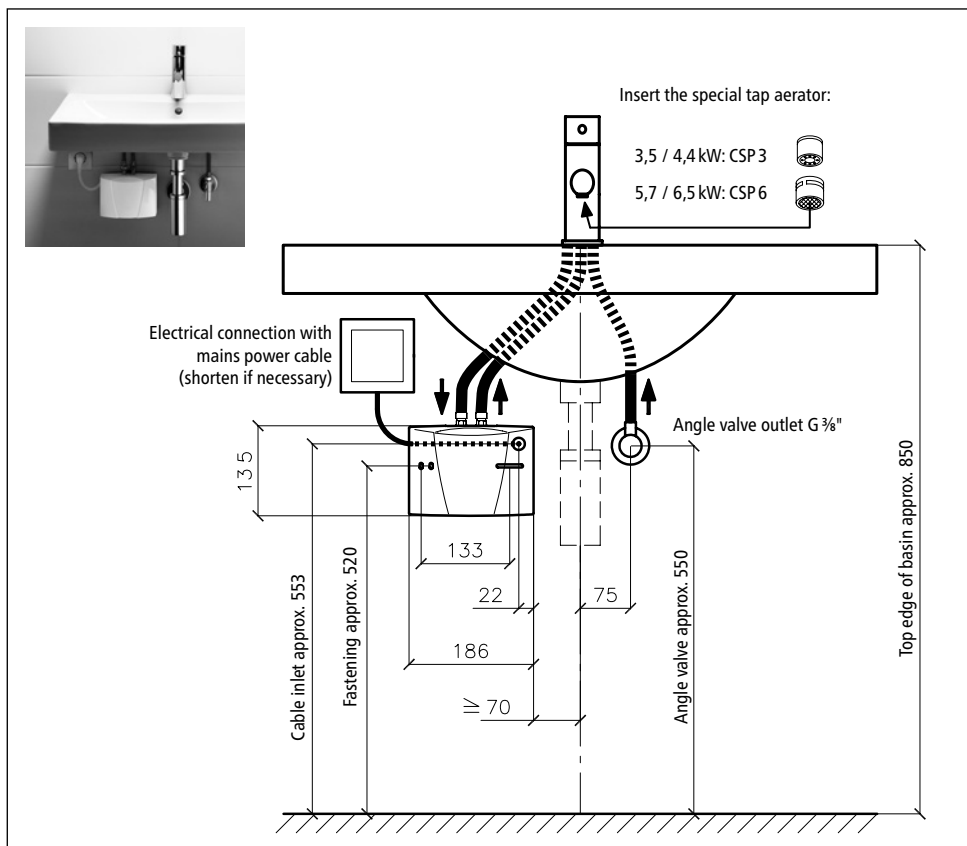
"Vented (open) installation with a special open-outlet tap" (dimensions in mm)
